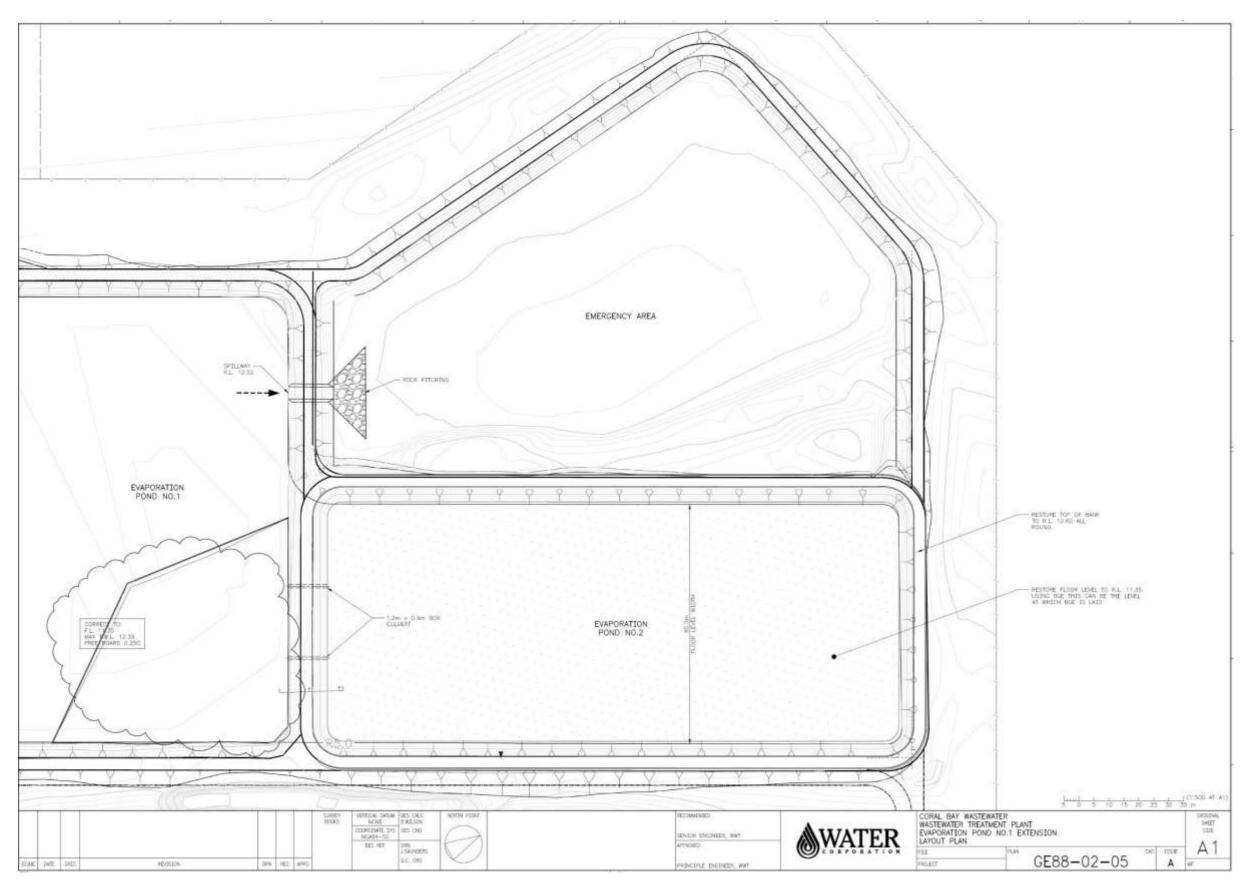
Coral Bay Wastewater Treatment Plant Evaporation Pond No. 1 Extension Layout - plan GE88-02-05
